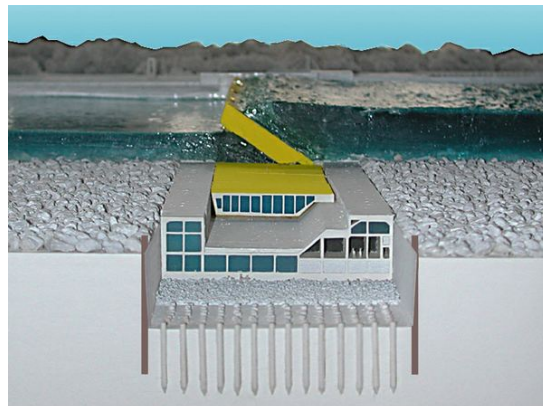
IMPRESSION PILE FOUNDATION MOSE BARRIER VENICE (RAUNEKK 2012)
